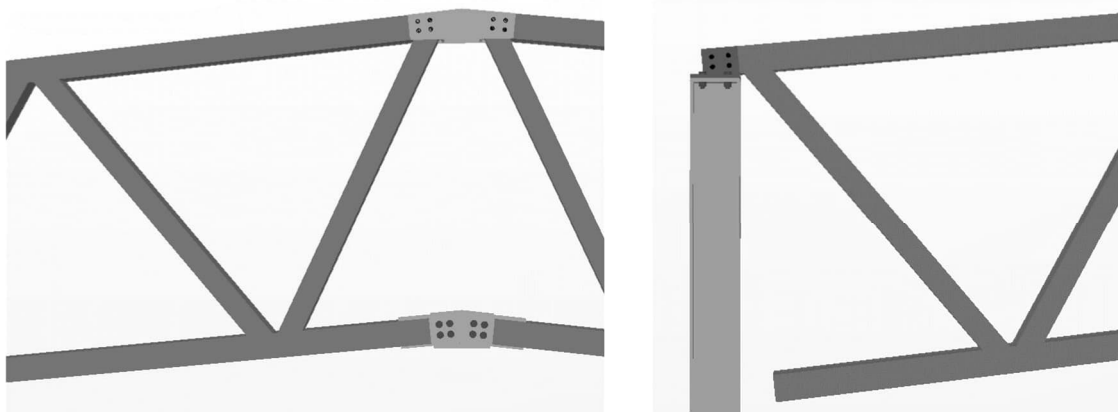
Connectors enabling truss assembly to different slopes [31]
